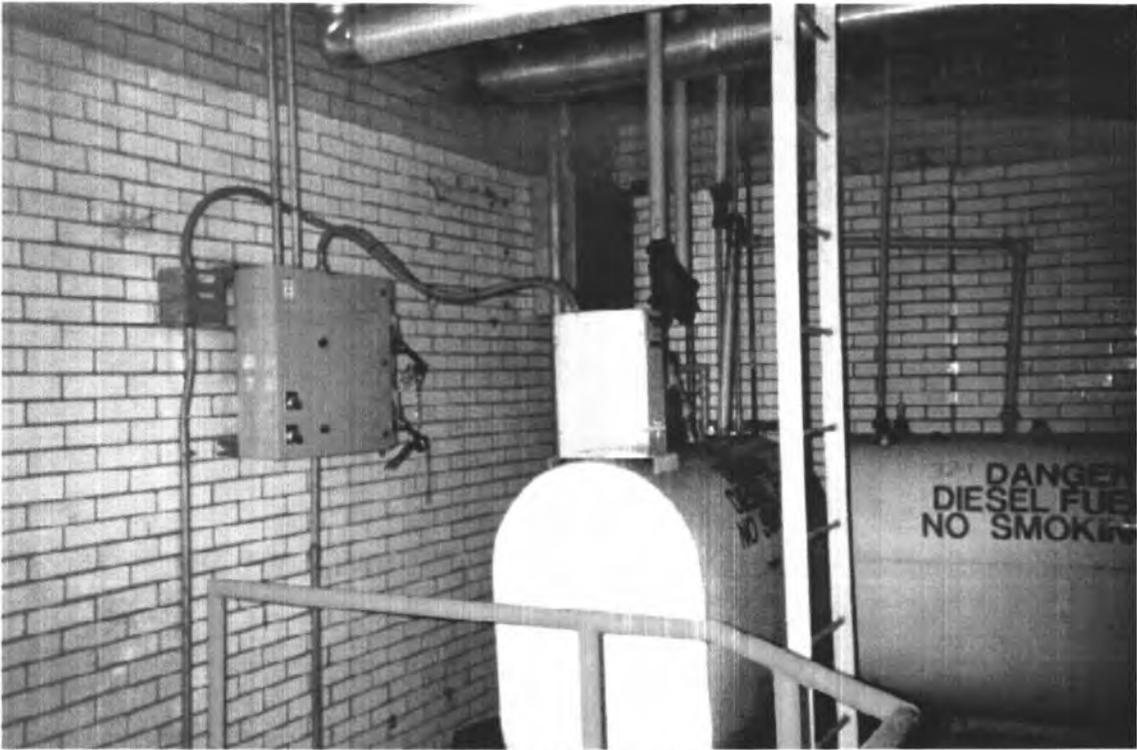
ASTs 32-1 and 32-2 inside building 32 before their removal.
